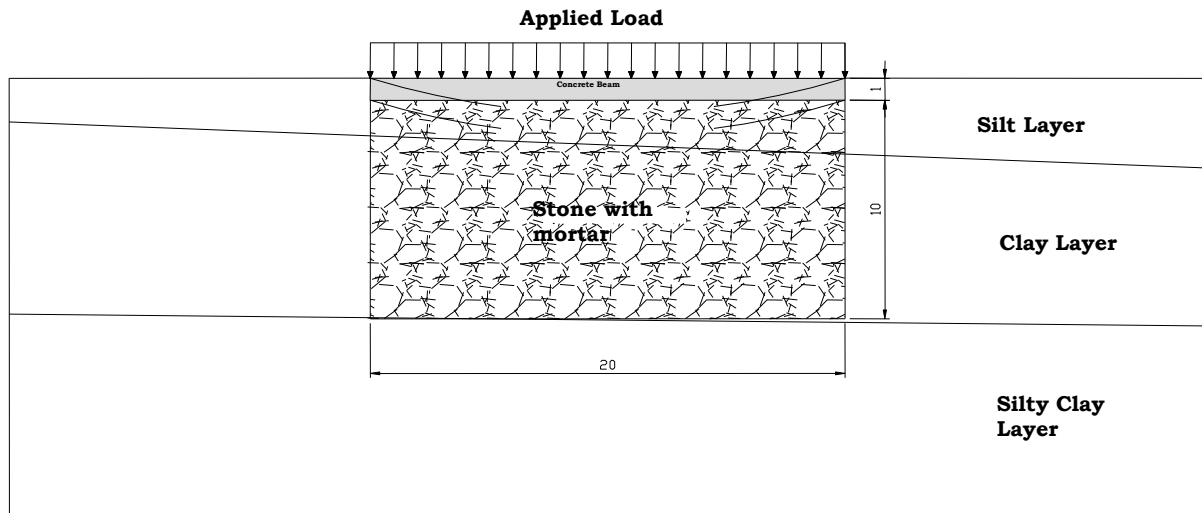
The deflection happened in the stone foundation consisting of stones and reinforced concrete beam only
